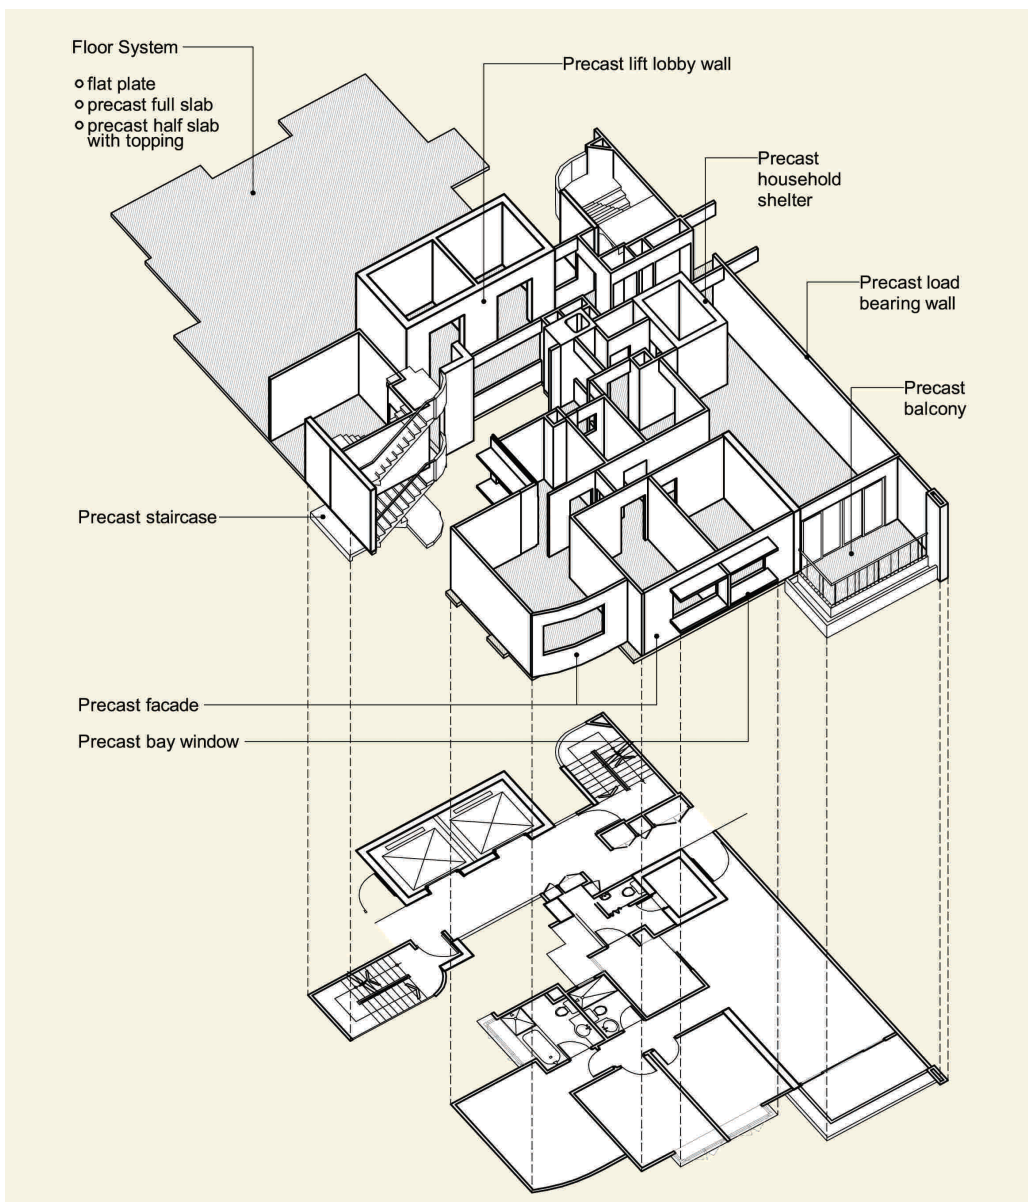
Example of a typical apartment unit using floor slab with precast loadbearing wall and façade system
